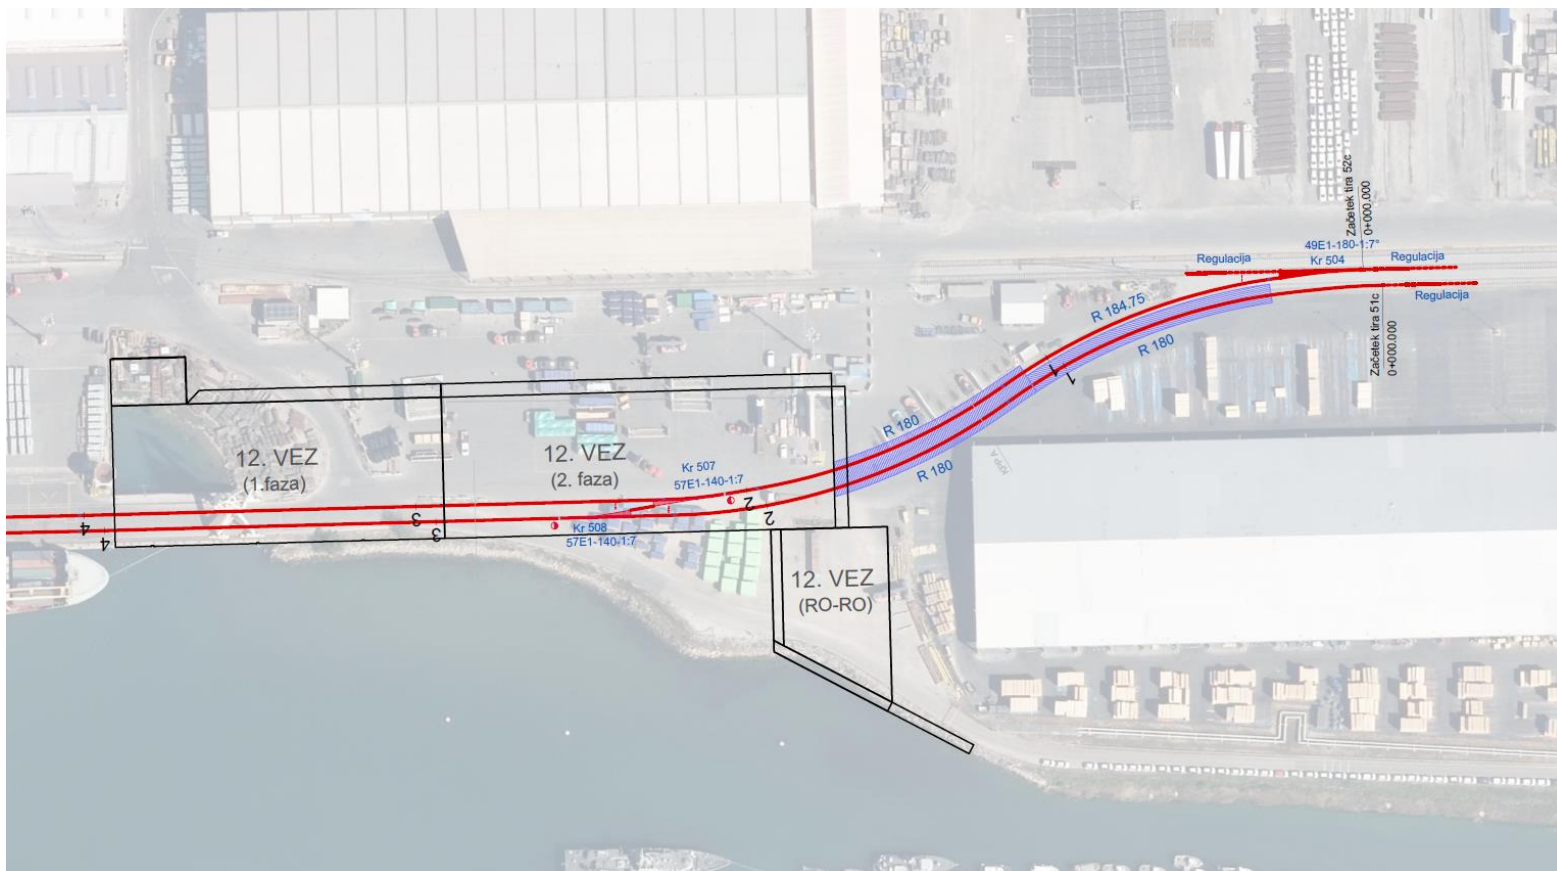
Demonstration of the course of railway tracks that are the subject of works
